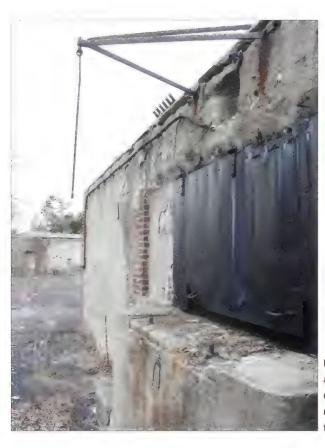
View of shell hoist metal door, Nine Gun Battery. Doors and windows should be properly mounted and locked to prevent unauthorized access. If a door is damaged or severely deteriorated, a new door should be fabricated to match the existing in materials and finish (Olmsted Center, January 2009).
